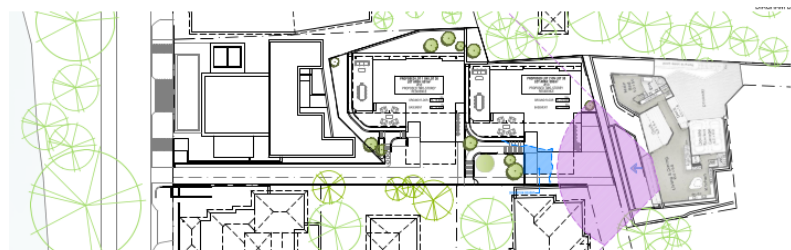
Floor Plan of Development Showing No.4 Lindsay Place Second Floor View.
